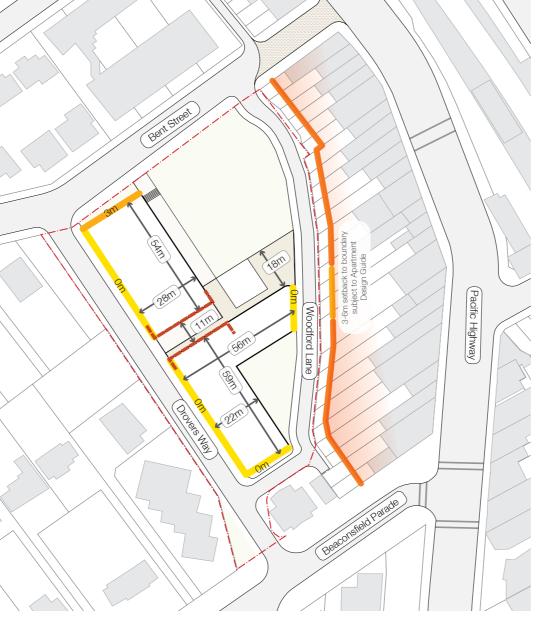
DCP Master Plan - Setbacks image source: p14-162 of KMC Local Centres DCP
